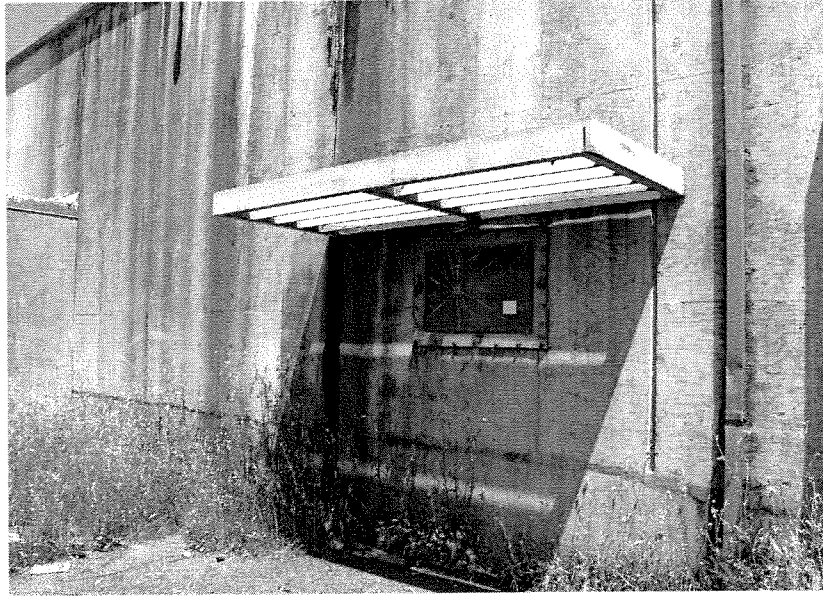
Test Control Center (Unit 121), Beta Test Complex, 1963-1964. Viewing port on west façade near northwest corner. Looking northeast. View of May 2005.
